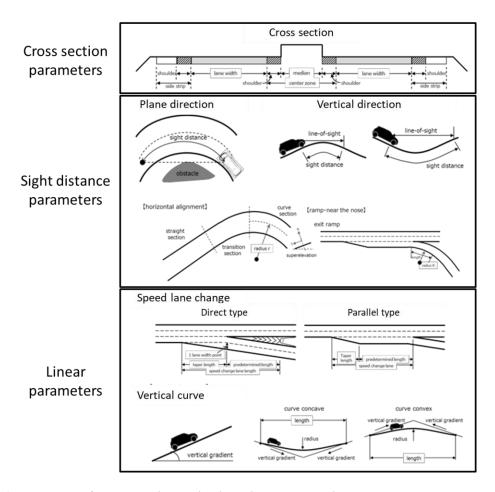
An example of cross-sections, viewing distance, and linear road parameters based on the Japanese Cabinet Order on Road Structure.
